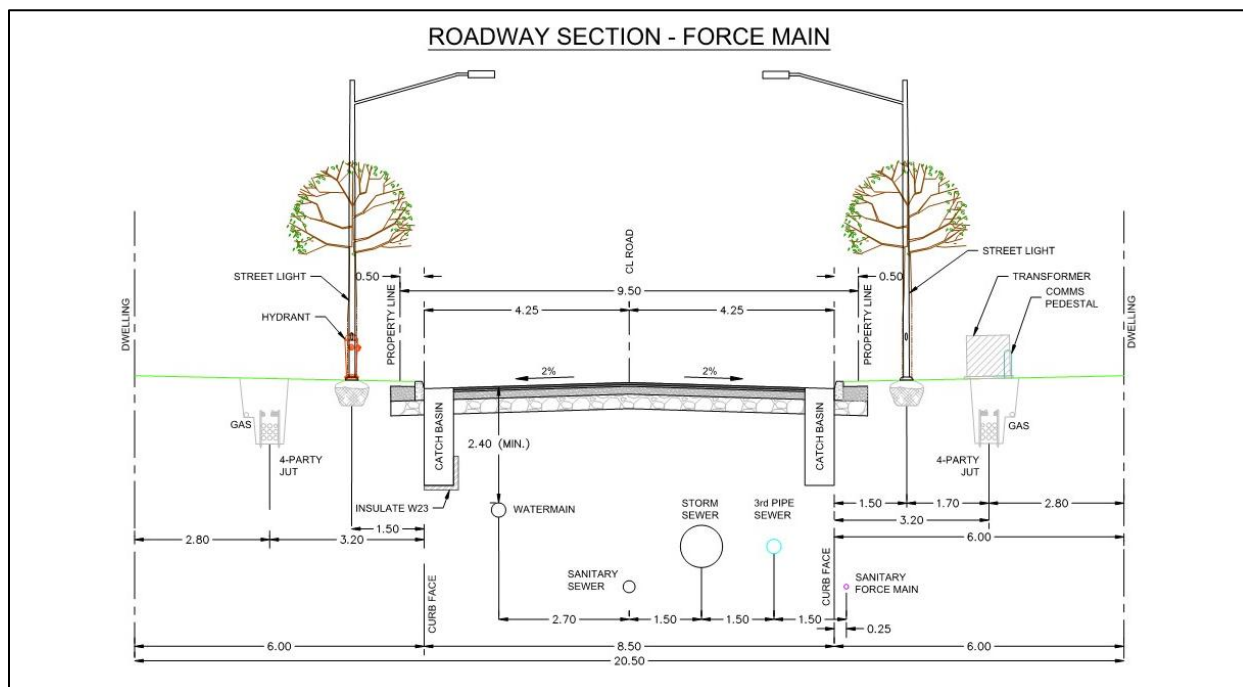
Excerpt from the Roadway Section – Force Main cross-section prepared by Novatech dated August 18, 2025.
